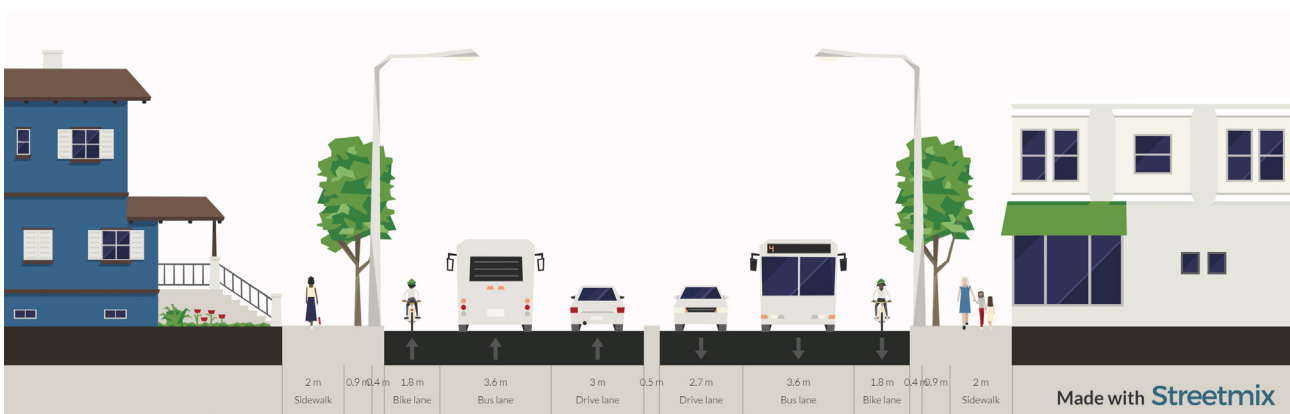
P2 - Cross Section of the De Soysa Road
